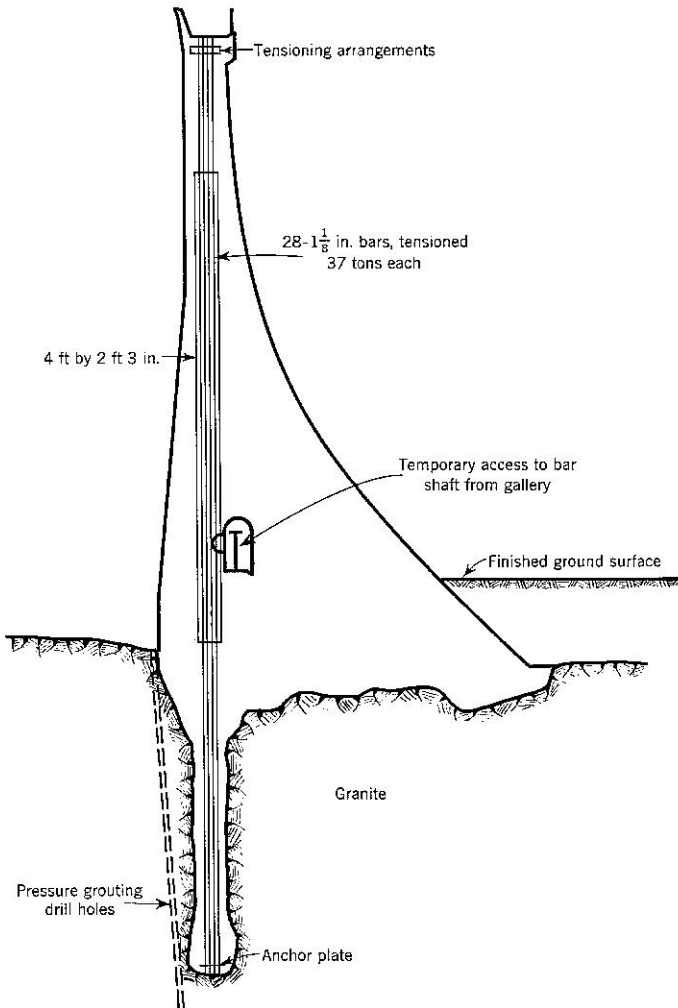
TYPICAL CROSS SECTION OF THE PRESTRESSED SECTION OF THE ALLTNA-LAIRIGE DAM
